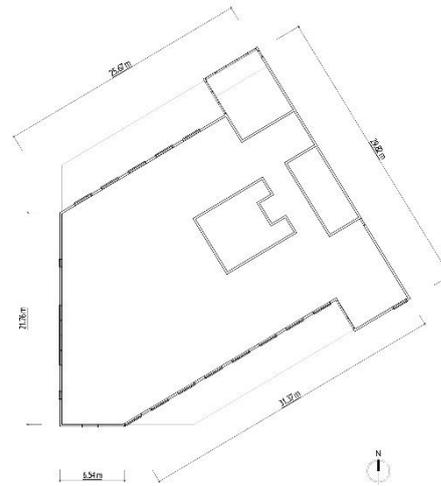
The plan of the selected floor displays its dimensions and layout
